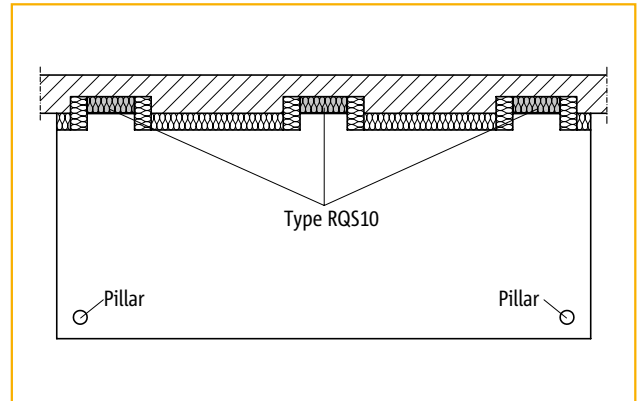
Connection of a balcony to an existing floor using type RQS, supported construction
